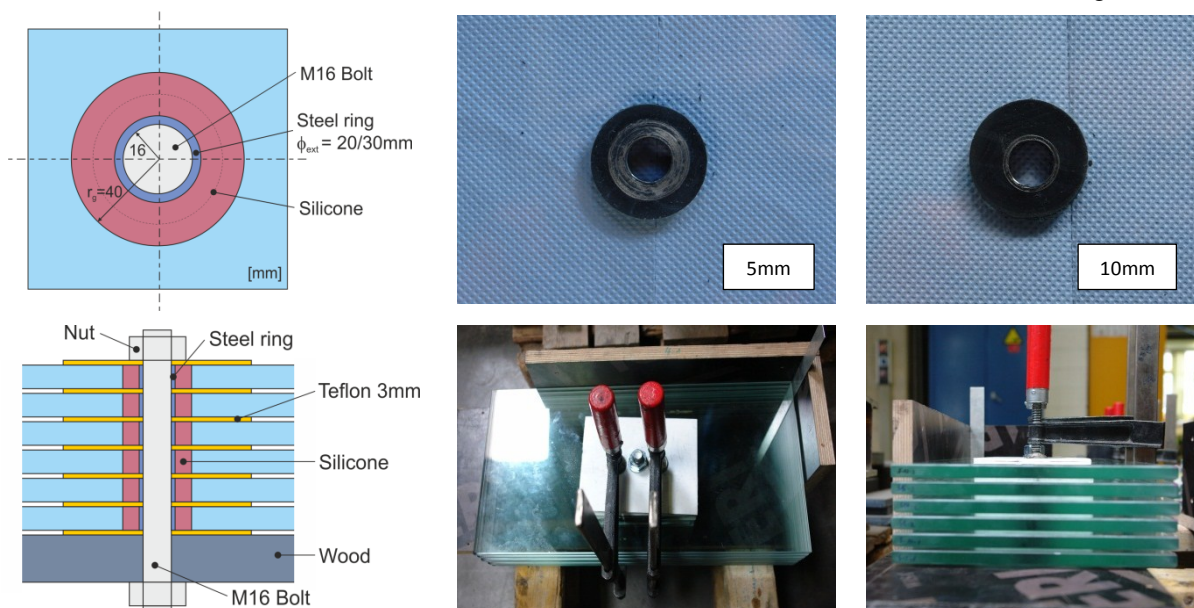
Composition of the small-scale mechanical-adhesive connection (1 hole) and production details
